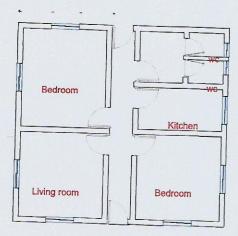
Floor plan of Apo Resettlement scheme Source: Author's field work, 2011
